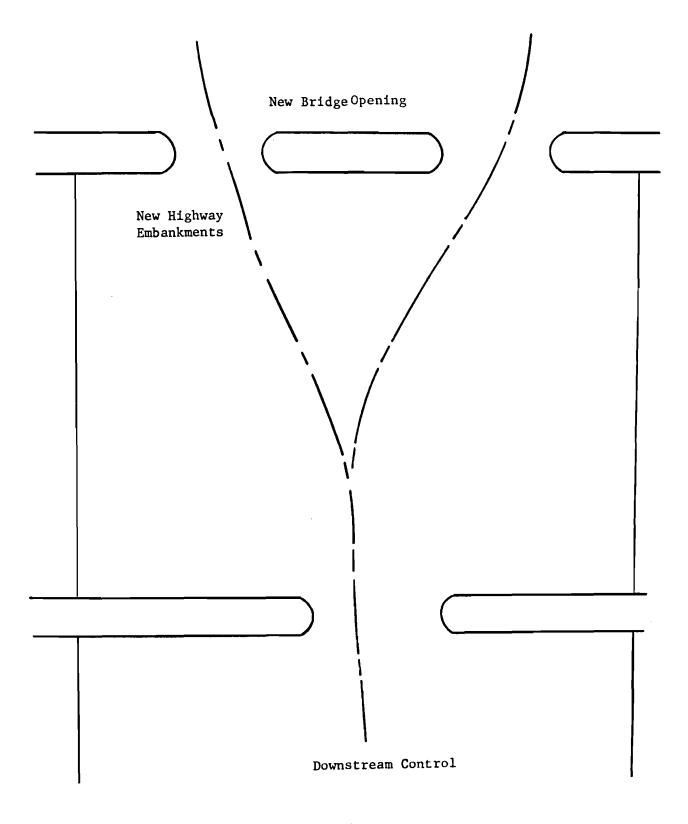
Multiple Bridge Openings with Downstream Control.
